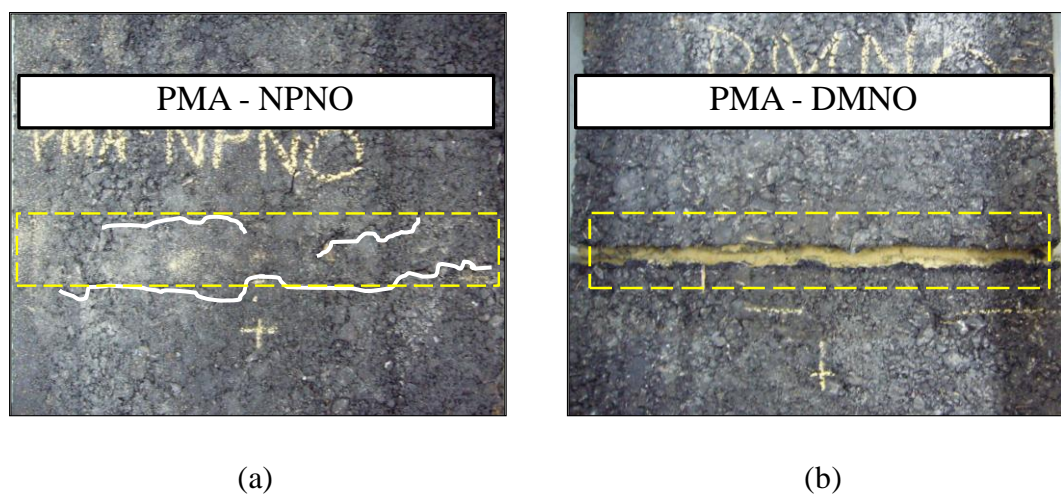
Surface cracking in unreinforced polymer modified asphalt pavements: (a) new pavement (NPNO) and (b) overlaid pavement (DMNO)
